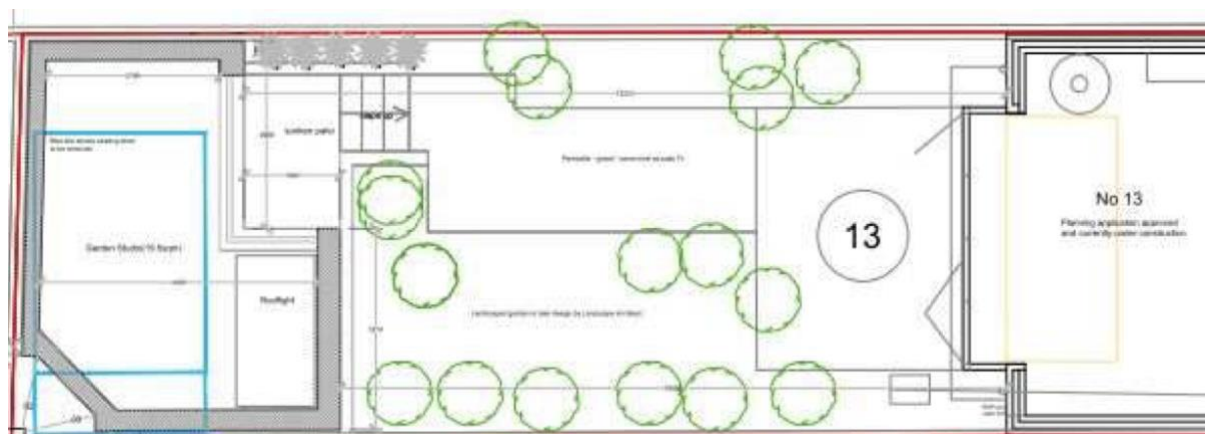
Wall to wall extensions seal off the garden from other and raise boundary walls.
